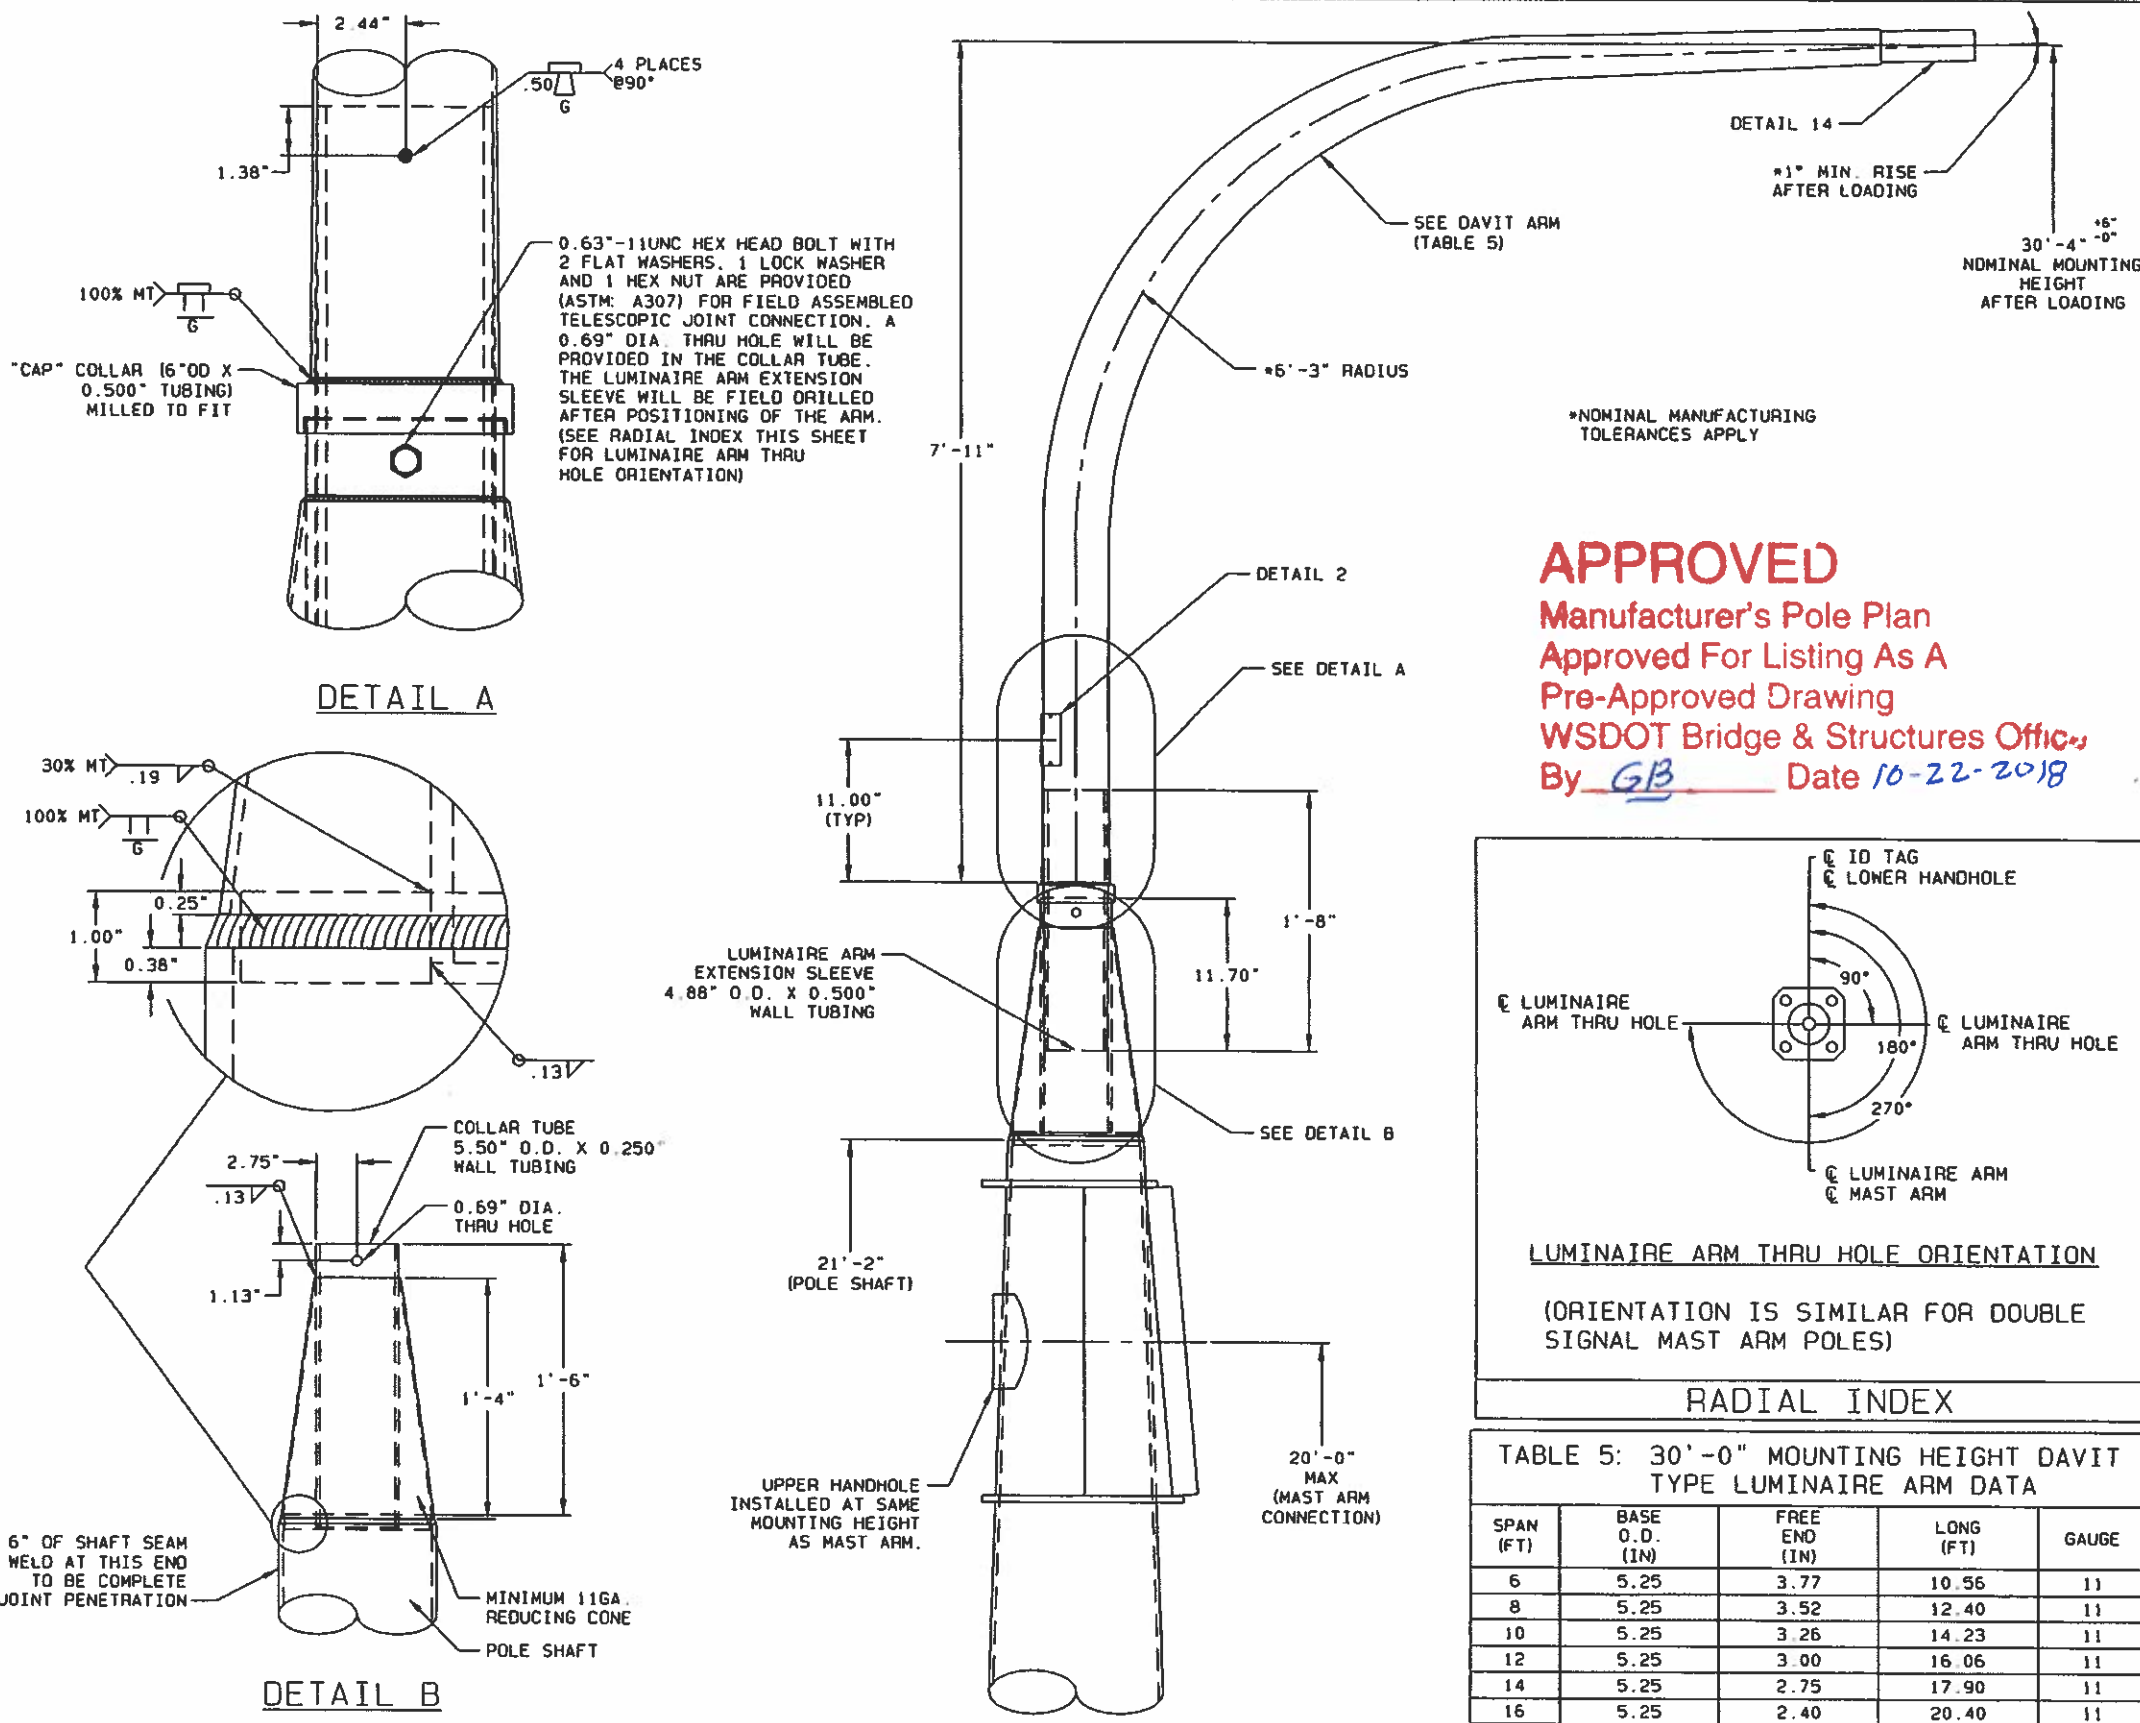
DAVIT TYPE LUMINAIRE ARM
